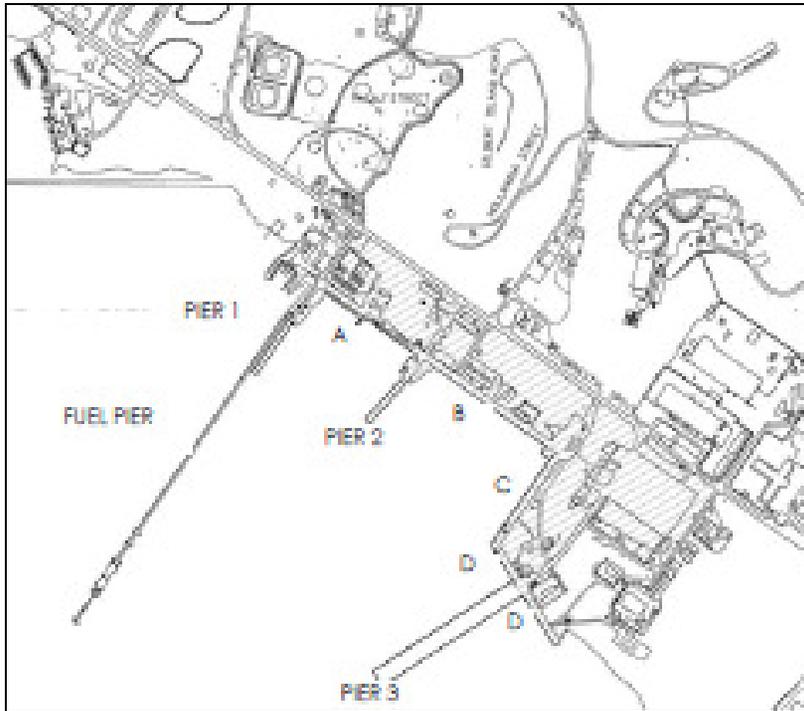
Site Plan Showing Existing Piers and Bulkheads
